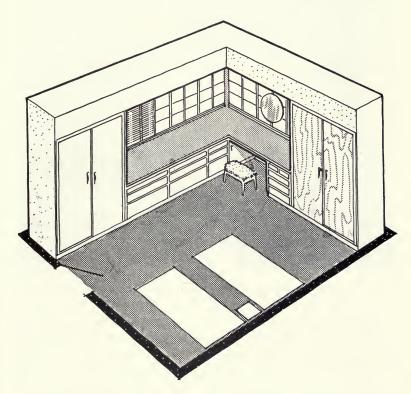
Bedroom with corner windows and built-in furniture and closets.
